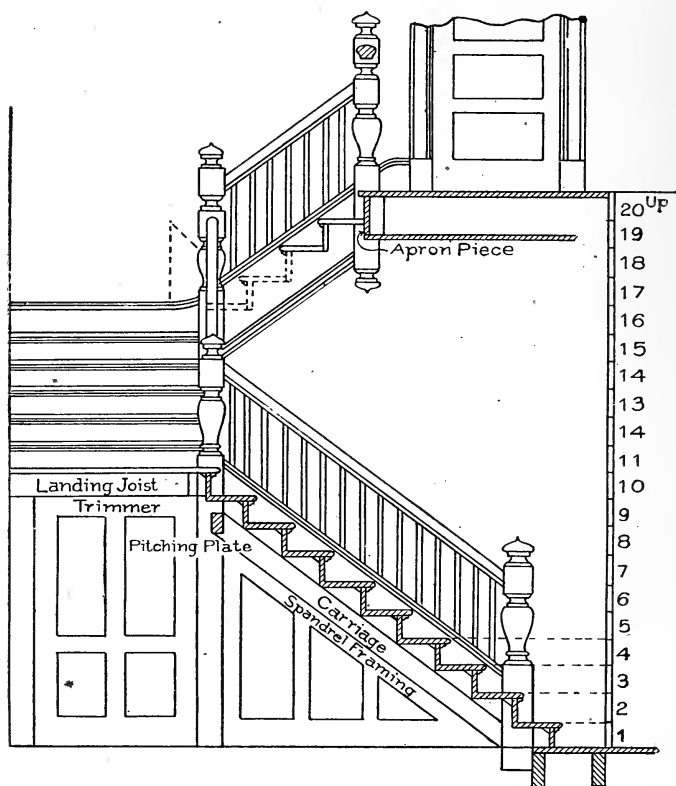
Elevation of Open-Newel Stair Shown in Plan in Fig. 54.
